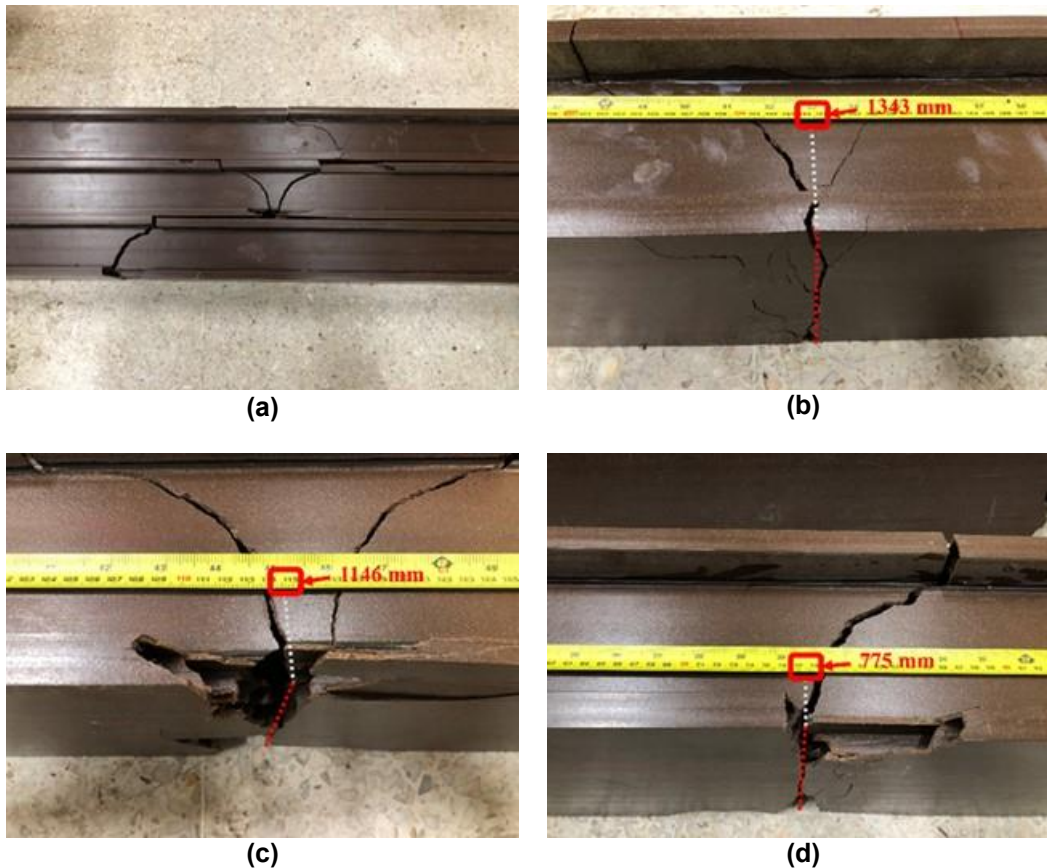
Glulam WPVC composite hollow member failure: (a) Specimen failures (b) First specimen failure location (c) Second specimen failure location and (d) Third specimen failure location
